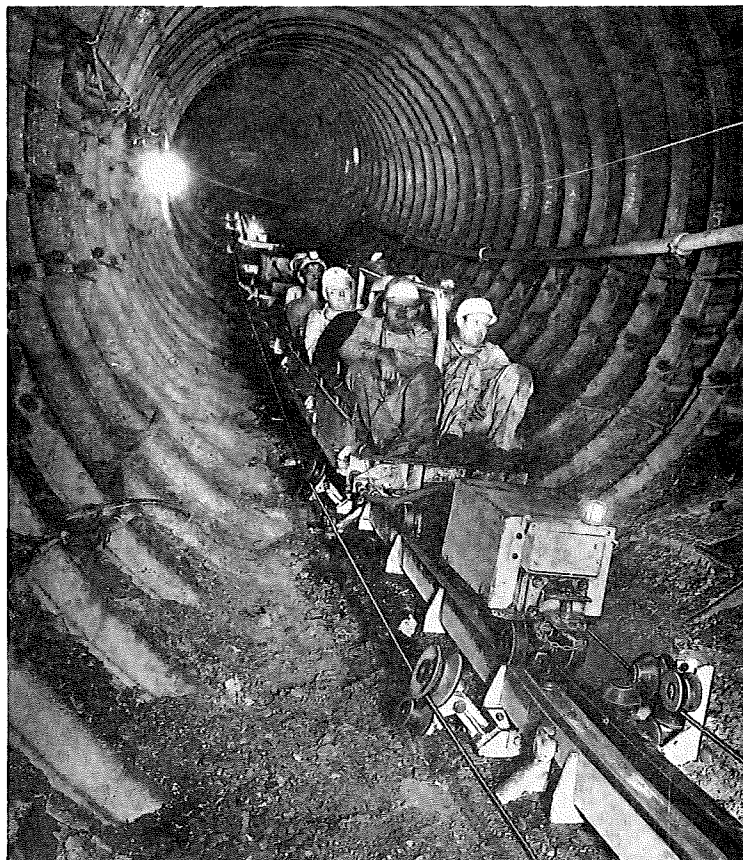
ROAD RAILER PERSONNEL TRANSPORT ON INCLINED ROADWAY. (PHOTO COURTESY BECORIT GRUBENAUSBAU GMBH.)
